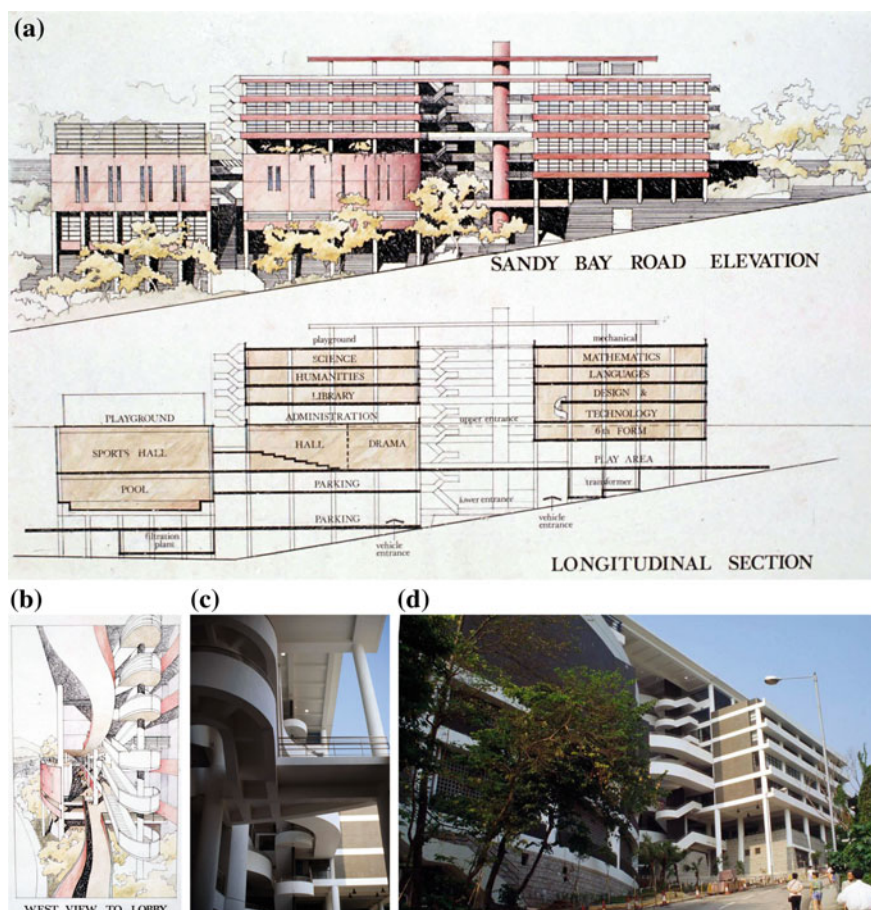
Western Island School, English School Foundation, 1990s. a Elevation and section. b Curvilinear interests in staircase and corridor. c Semi-open public space. d Street view. Courtesy of Prof. Patrick Lau
